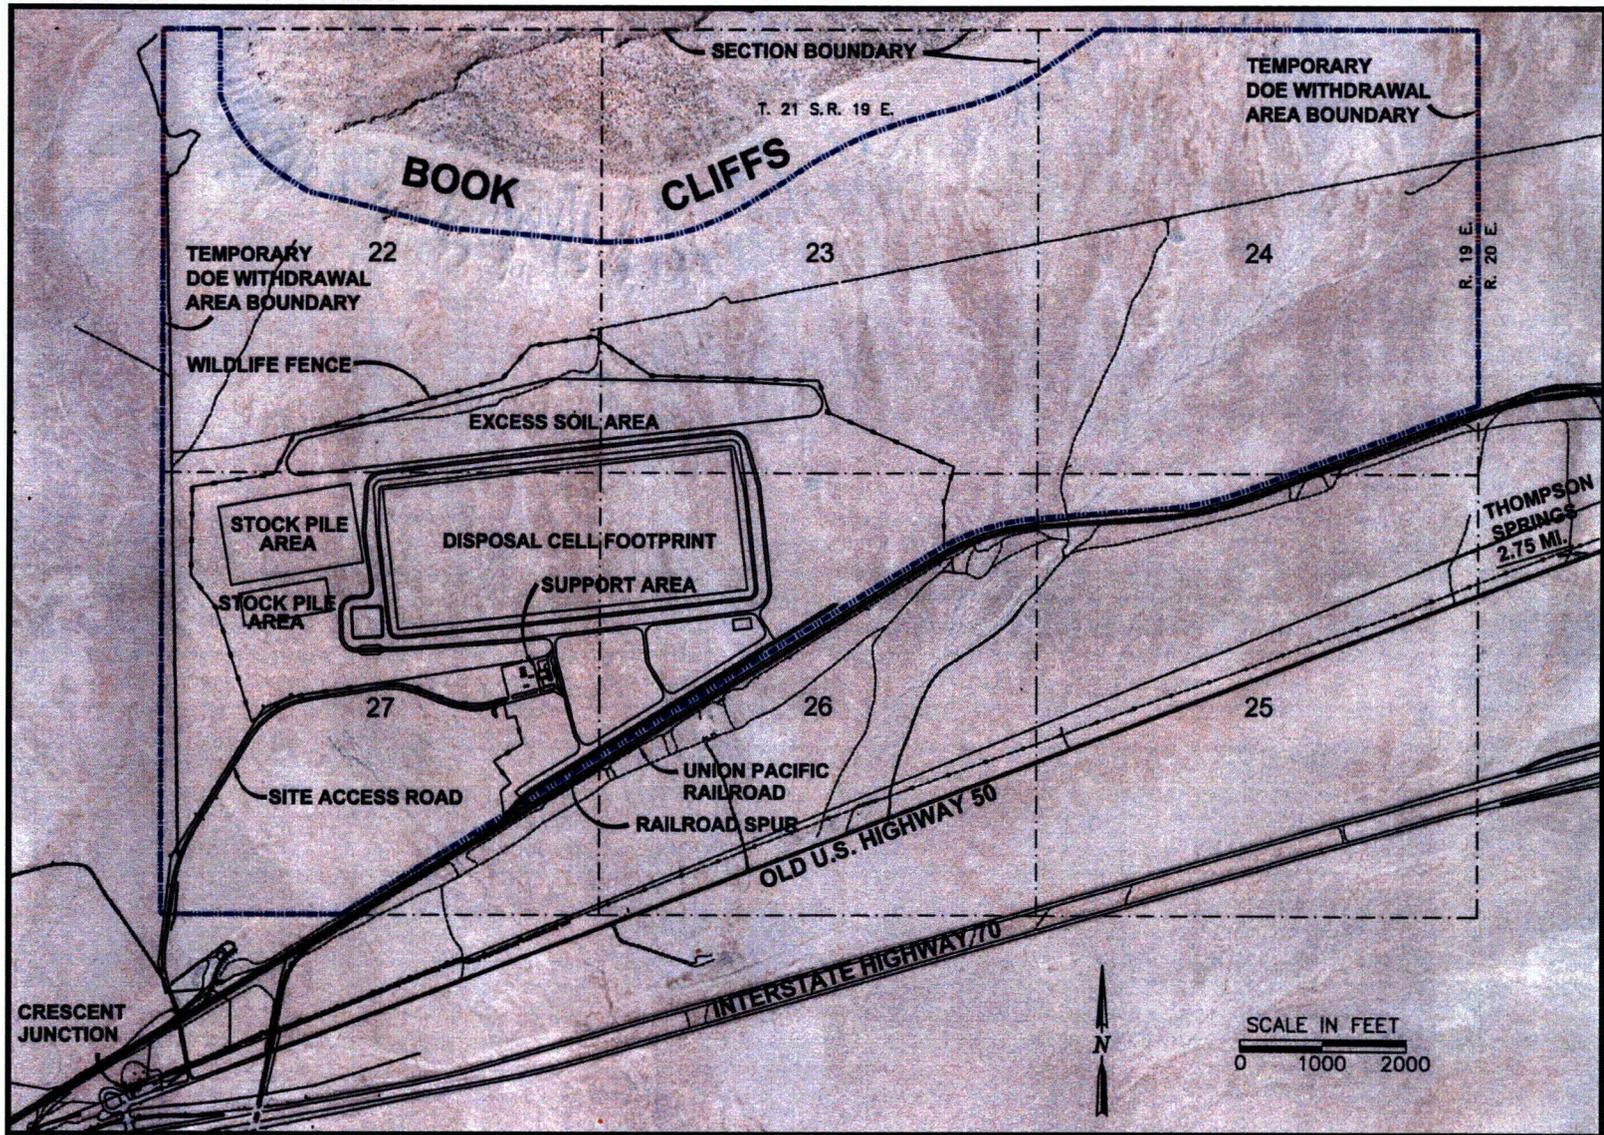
Crescent Junction Disposal Cell Footprint and Existing and Proposed Site Features
